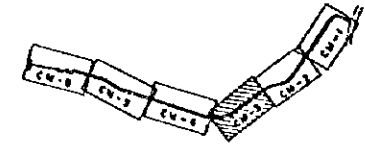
Plan of Saluran Cengkareng Drainage Channel (3)
